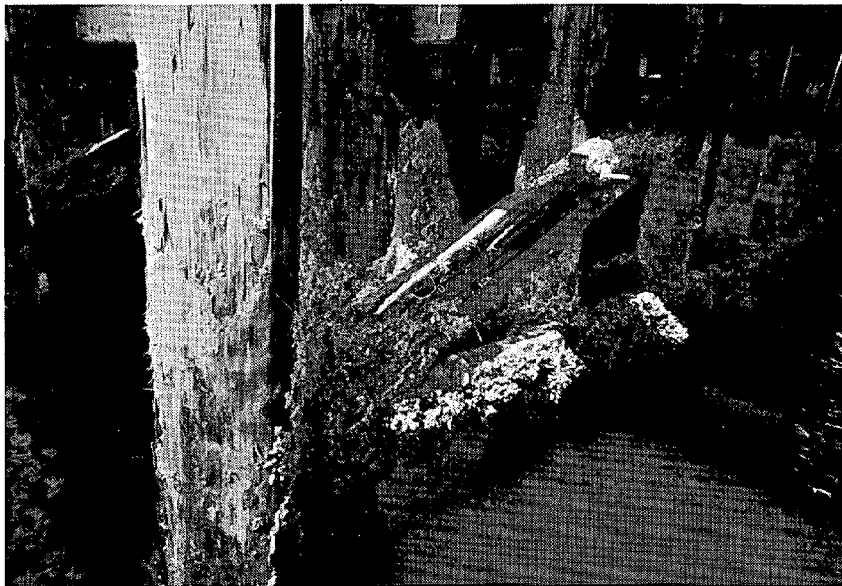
SPLINTERED TIMBER BRACING AT
